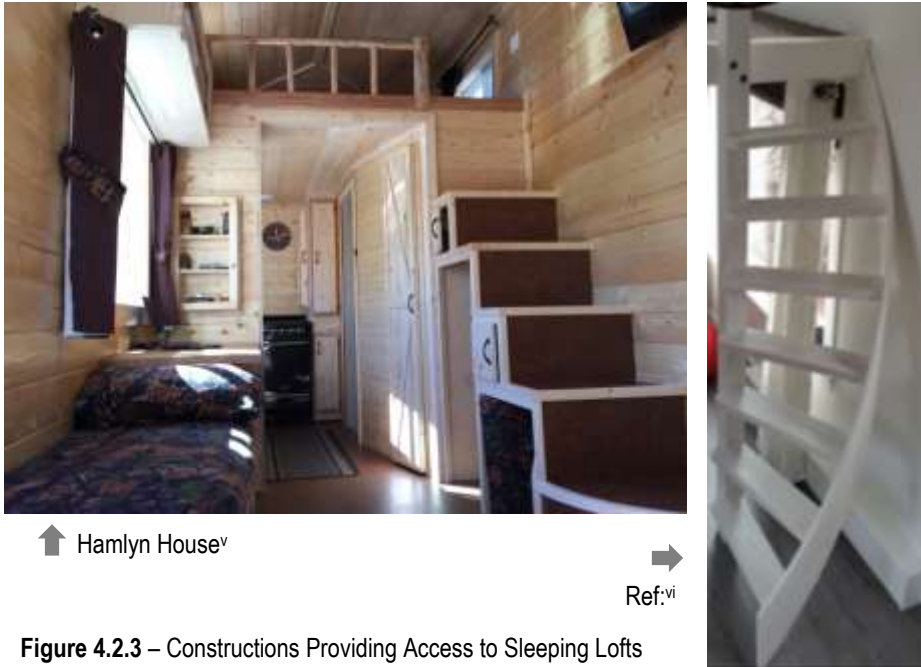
Constructions Providing Access to Sleeping Lofts
